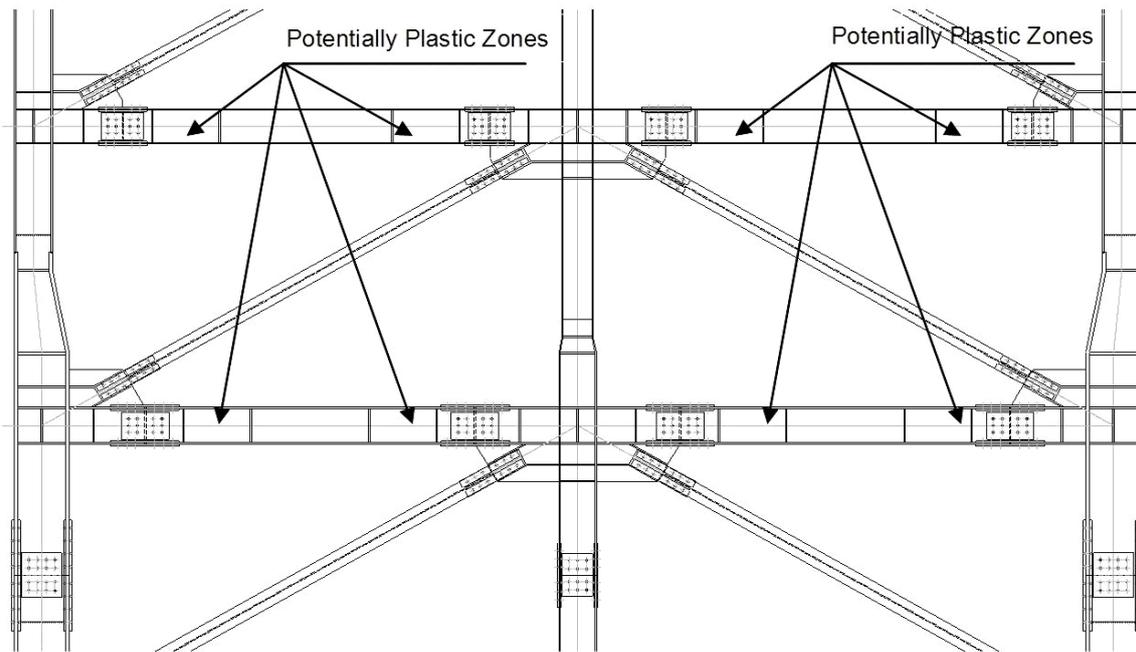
Location of the potentially plastic zones in the girders of a braced frame
